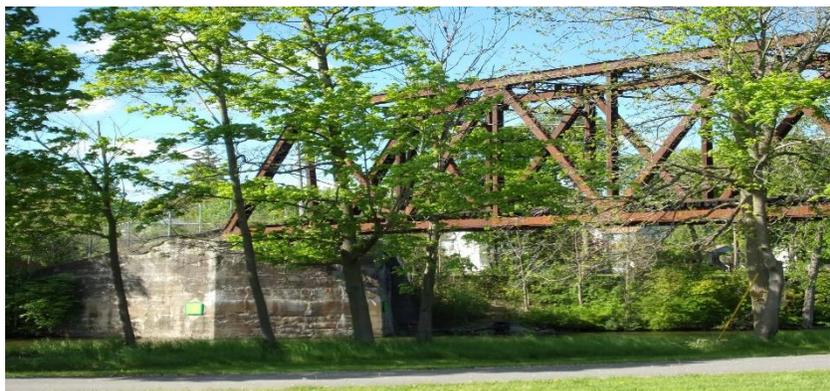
Former railroad bridge spanning the Erie Canal being proposed for use as a pedestrian bridge.
